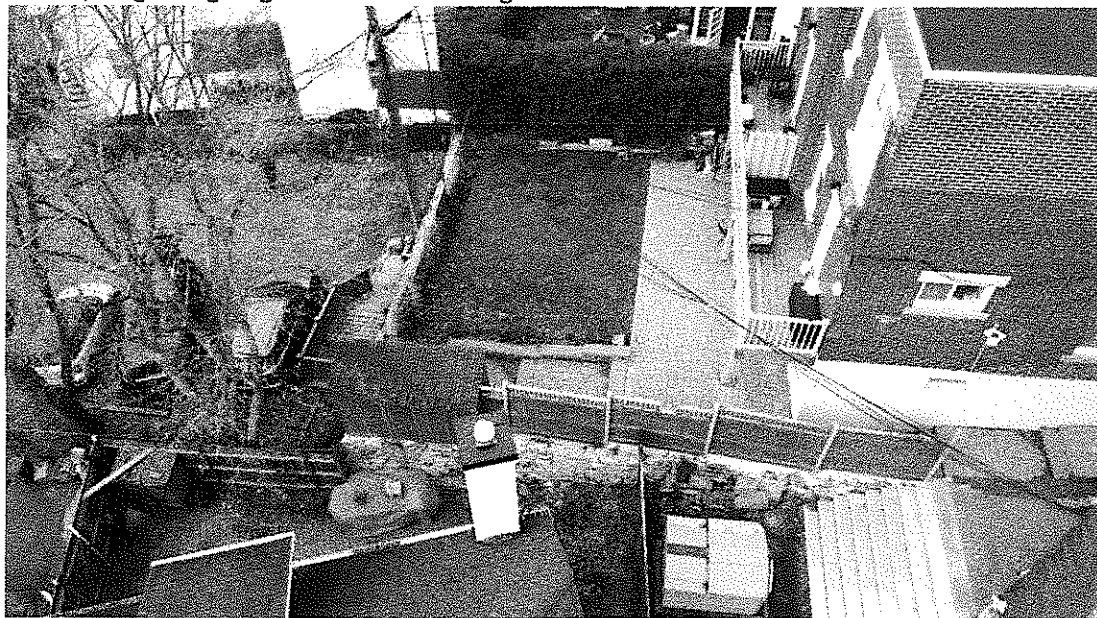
View of easement route, looking west to Putman from 11 Acacia. Note that shed in previous picture has been removed.
